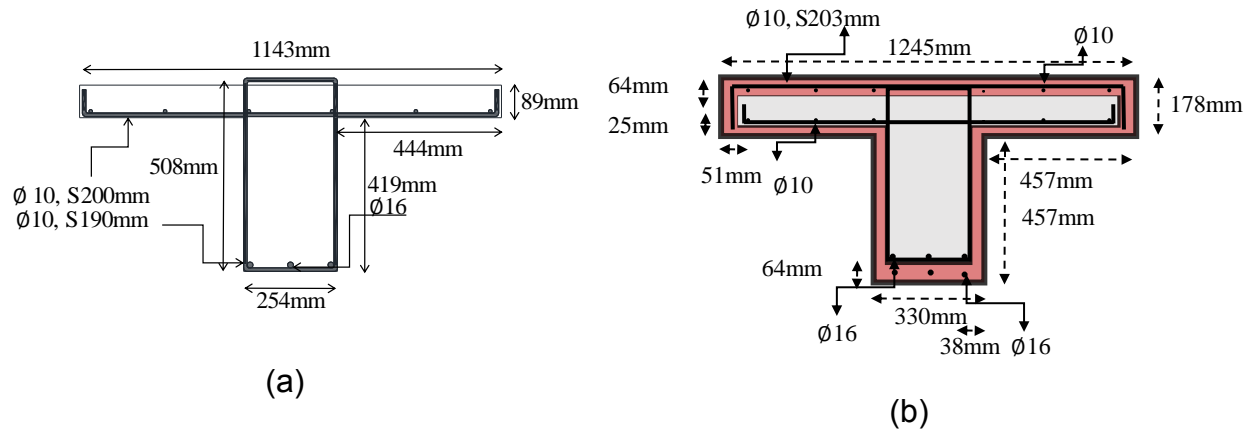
T-section deck section detail: (a) Damaged section; (b) Retrofitted section.
